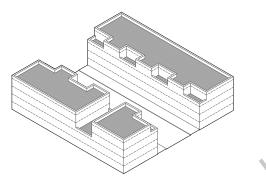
BUILDING ARTICULATION AT UPPER FLOORS ONLY
